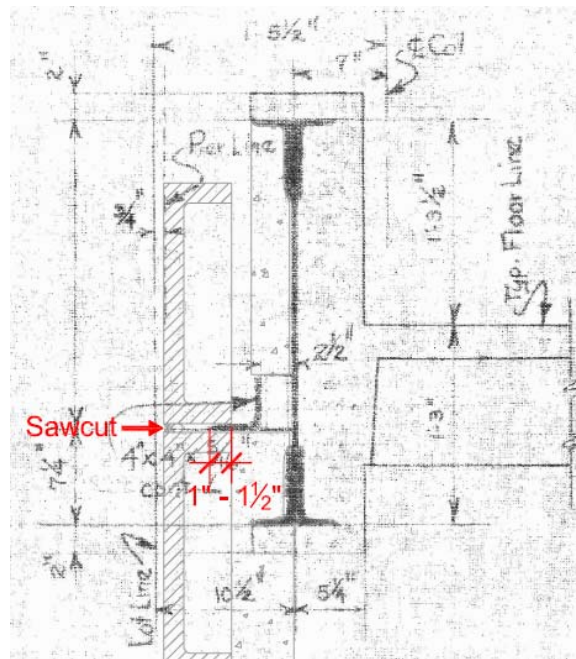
Original architectural detail at shelf angle location. Note bearing area dimension
